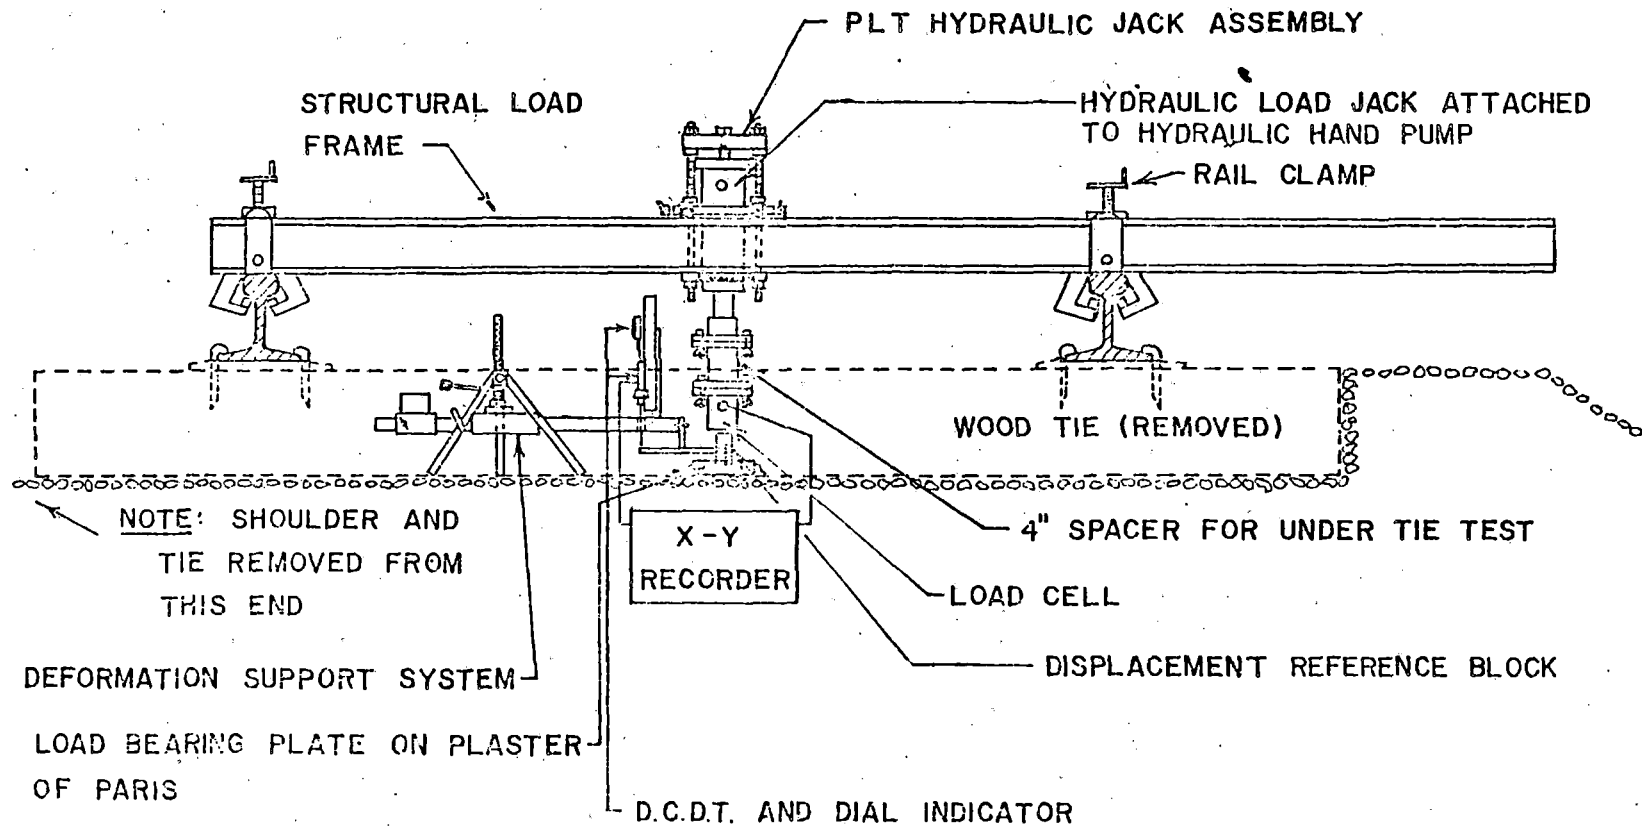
ASSEMBLED PLATE LOAD TEST APPARATUS
